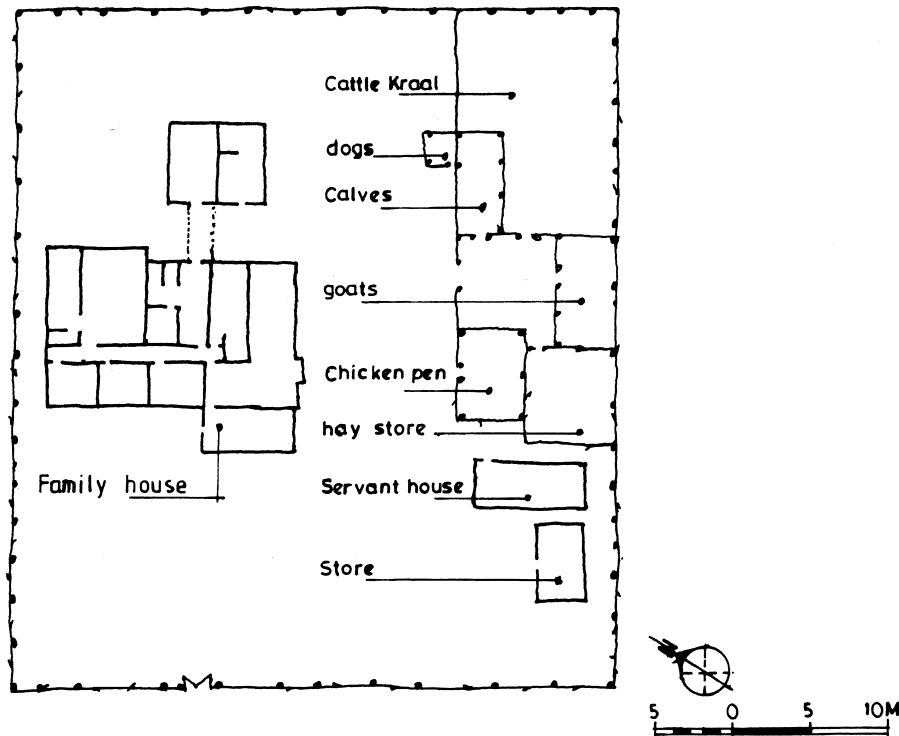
Modern homestead plan. Source: Rukwaro (1997, p. 294).
